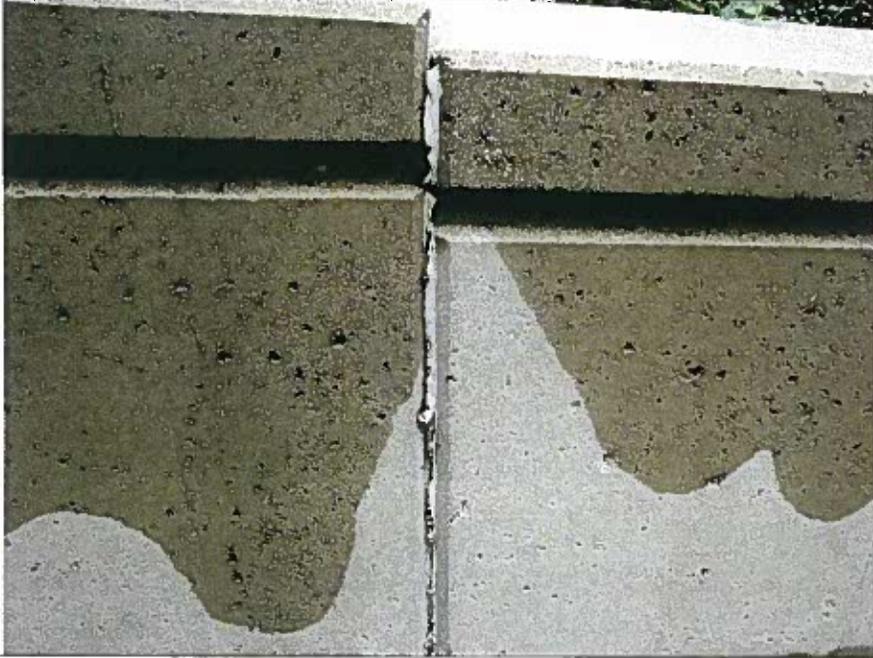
Deteriorated sealant on wall of ramp at northwest corner of plaza
